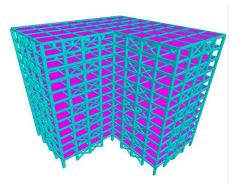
(c) – 3D view of Model 3 (X-Bracing alternative pattern at the face)
